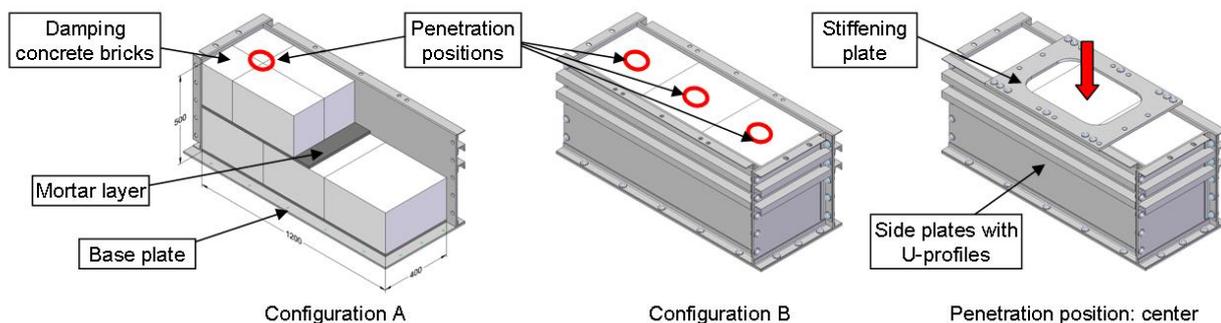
Configurations of mortared damping concrete specimens, steel frame construction
